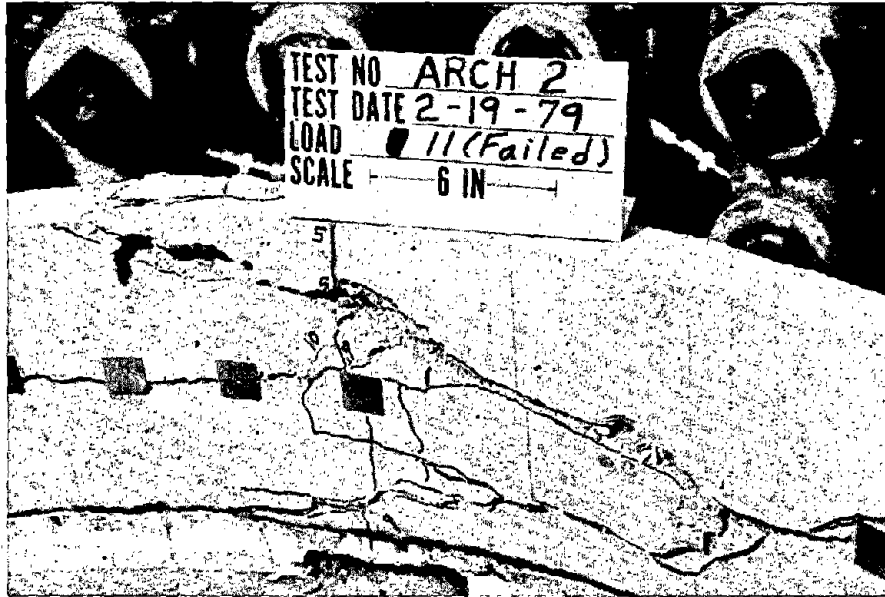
COMPRESSIVE FAILURE ZONE OF ARCH-2
